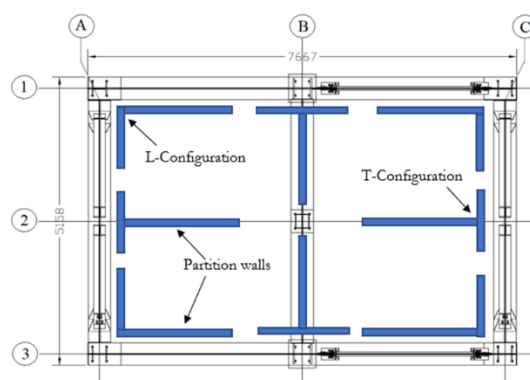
Preliminary configurations of partition walls on first and second floor of the test structure
